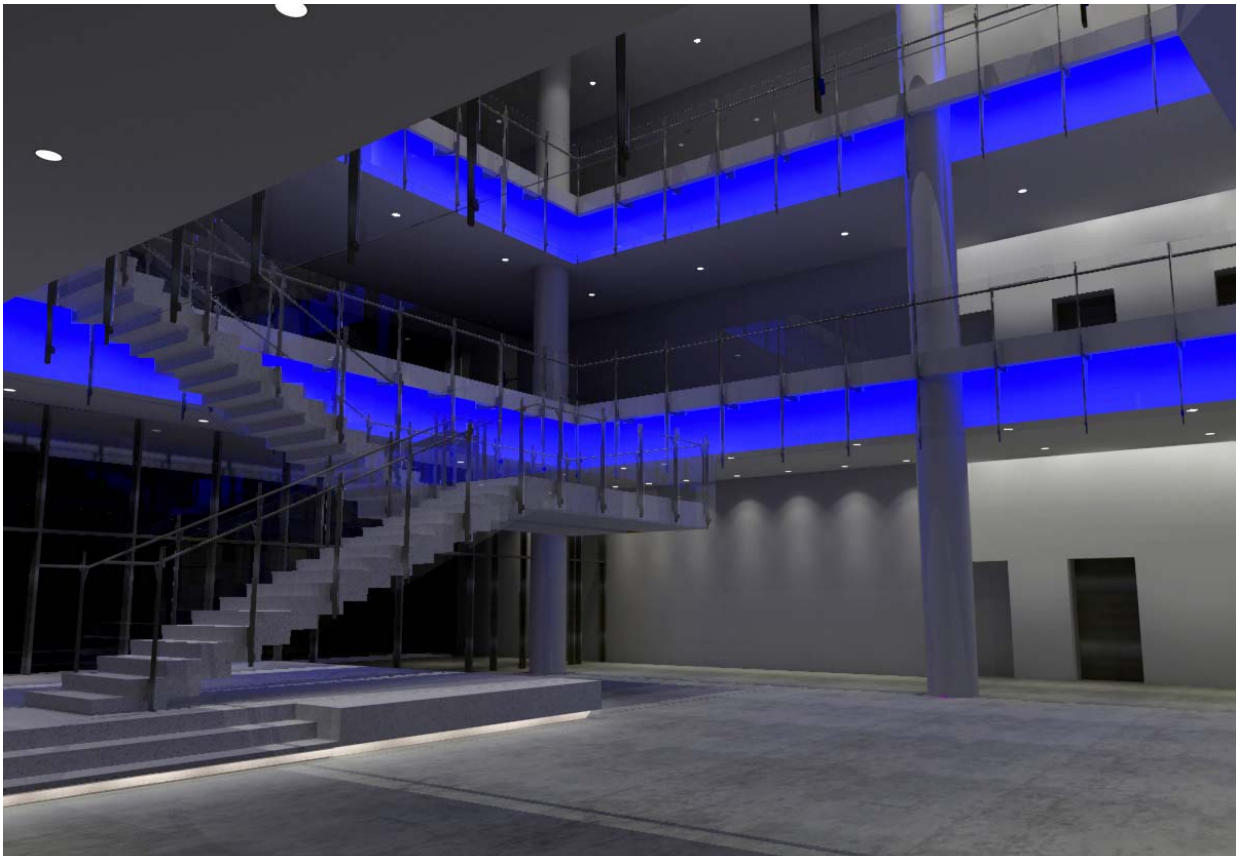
PERSPECTIVE LOOKING TOWARD THE STAIRS / BUILDING ENTRANCE (ENTERTAINMENT SCENE)
